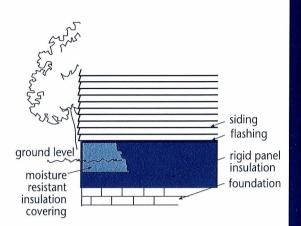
Insulating around the foundation of a house is best done during construction. If insulating after construction you will need to trench around the foundation to install insulation board.
